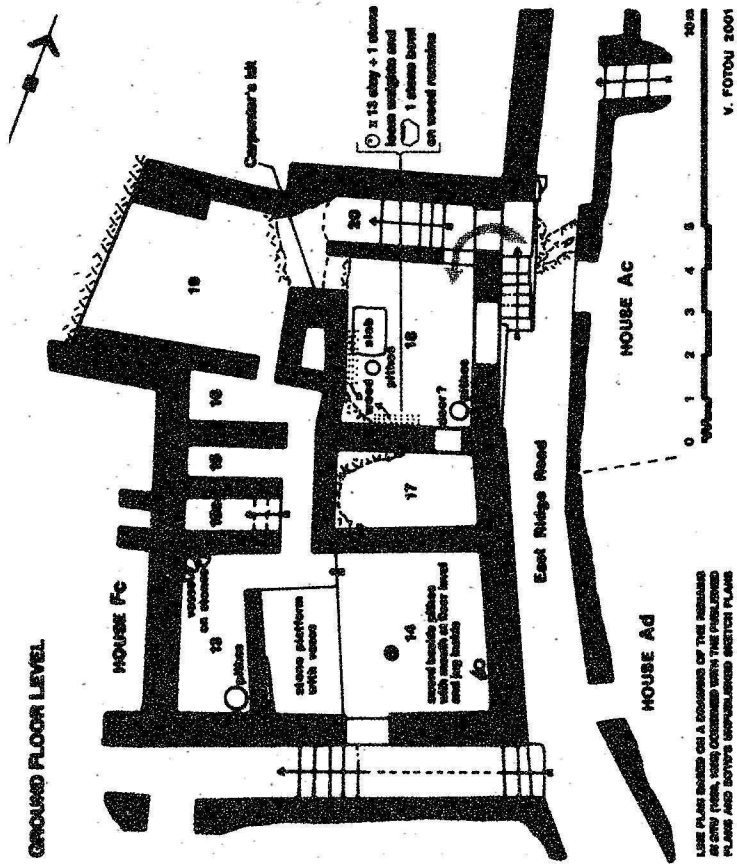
House Fd at Gourmia. Line plan of the ground floor with indication of main assemblages. Scale 1:175 (drawing: V. Fotou, 2001, based on a line plan of the remains, state 1989/1993, and combining information from H. Boyd's sketches and plans).
